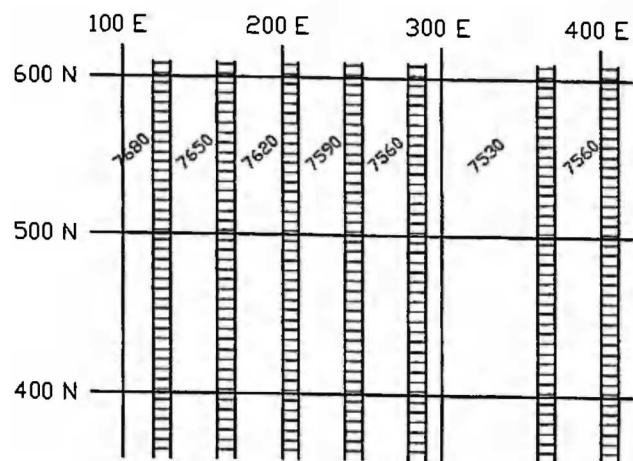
Plan view with the bench faces shaded and the flat segment elevations labelled.
